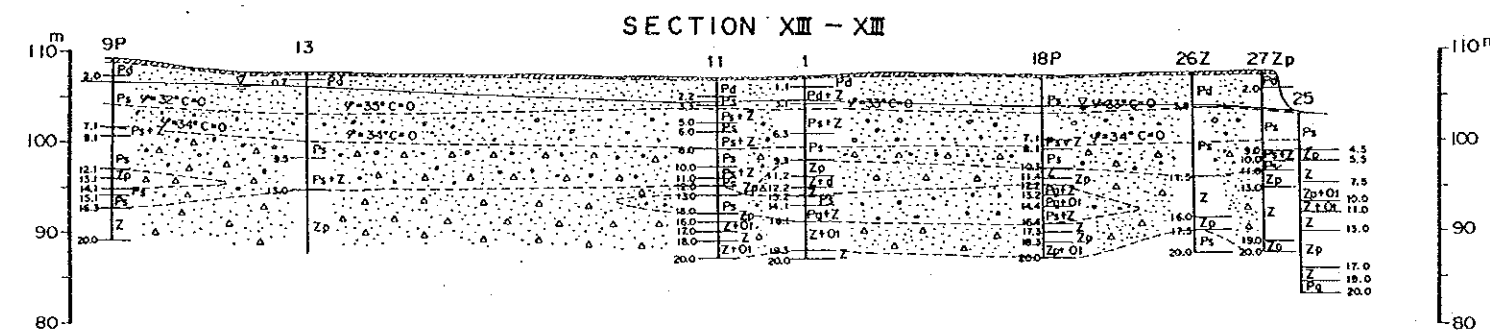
Sketch of structure drillings spacing and soil profiles
